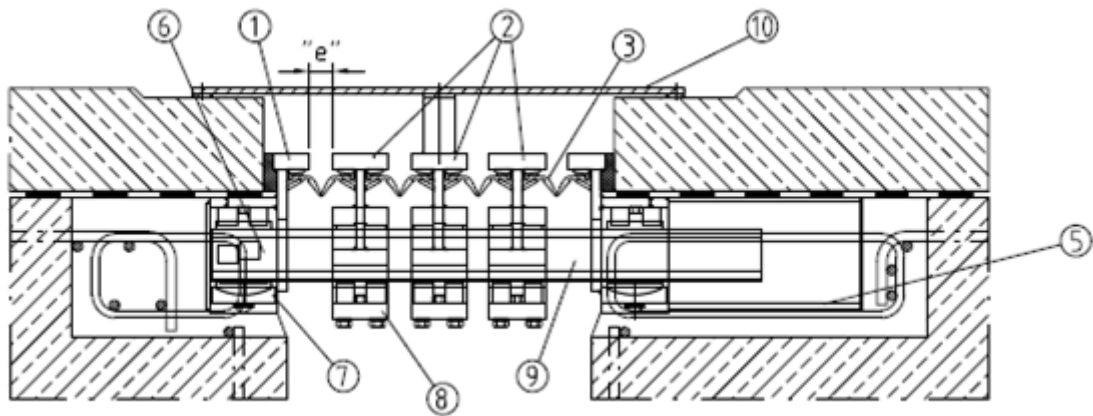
Cross section at footpath with crossbeam of single crossbeam modular expansion joint with shear control elements between centre beams and cover plate
